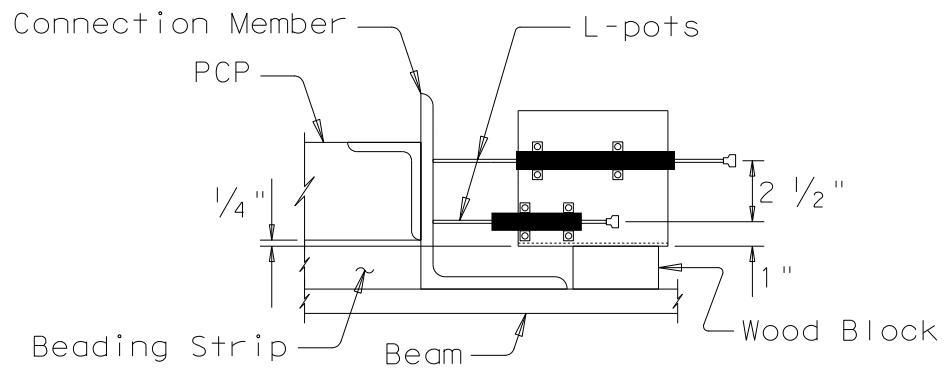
Elevation of L-pots on Connection Member for Tests 5-8
